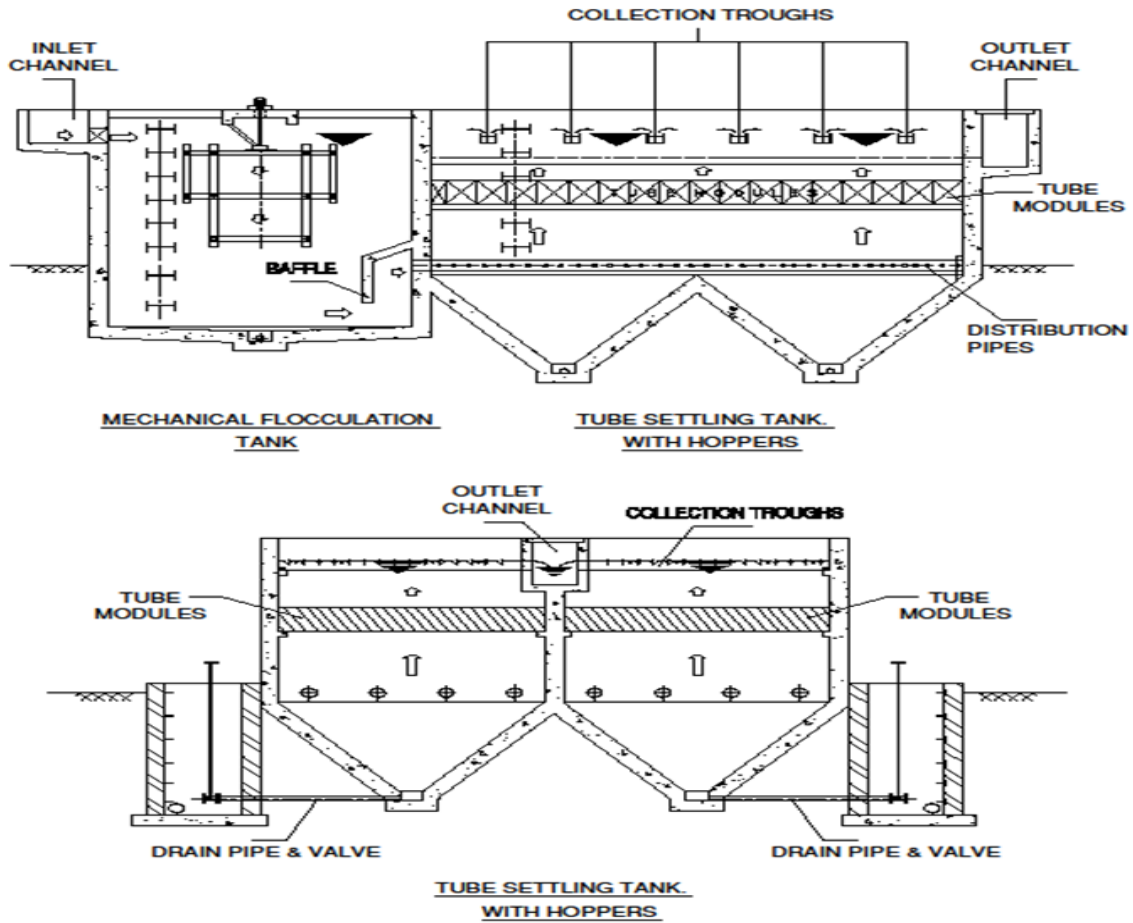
Typical Details of External Flocculation Tanks and Tube Settling Tanks with hopper bottom
